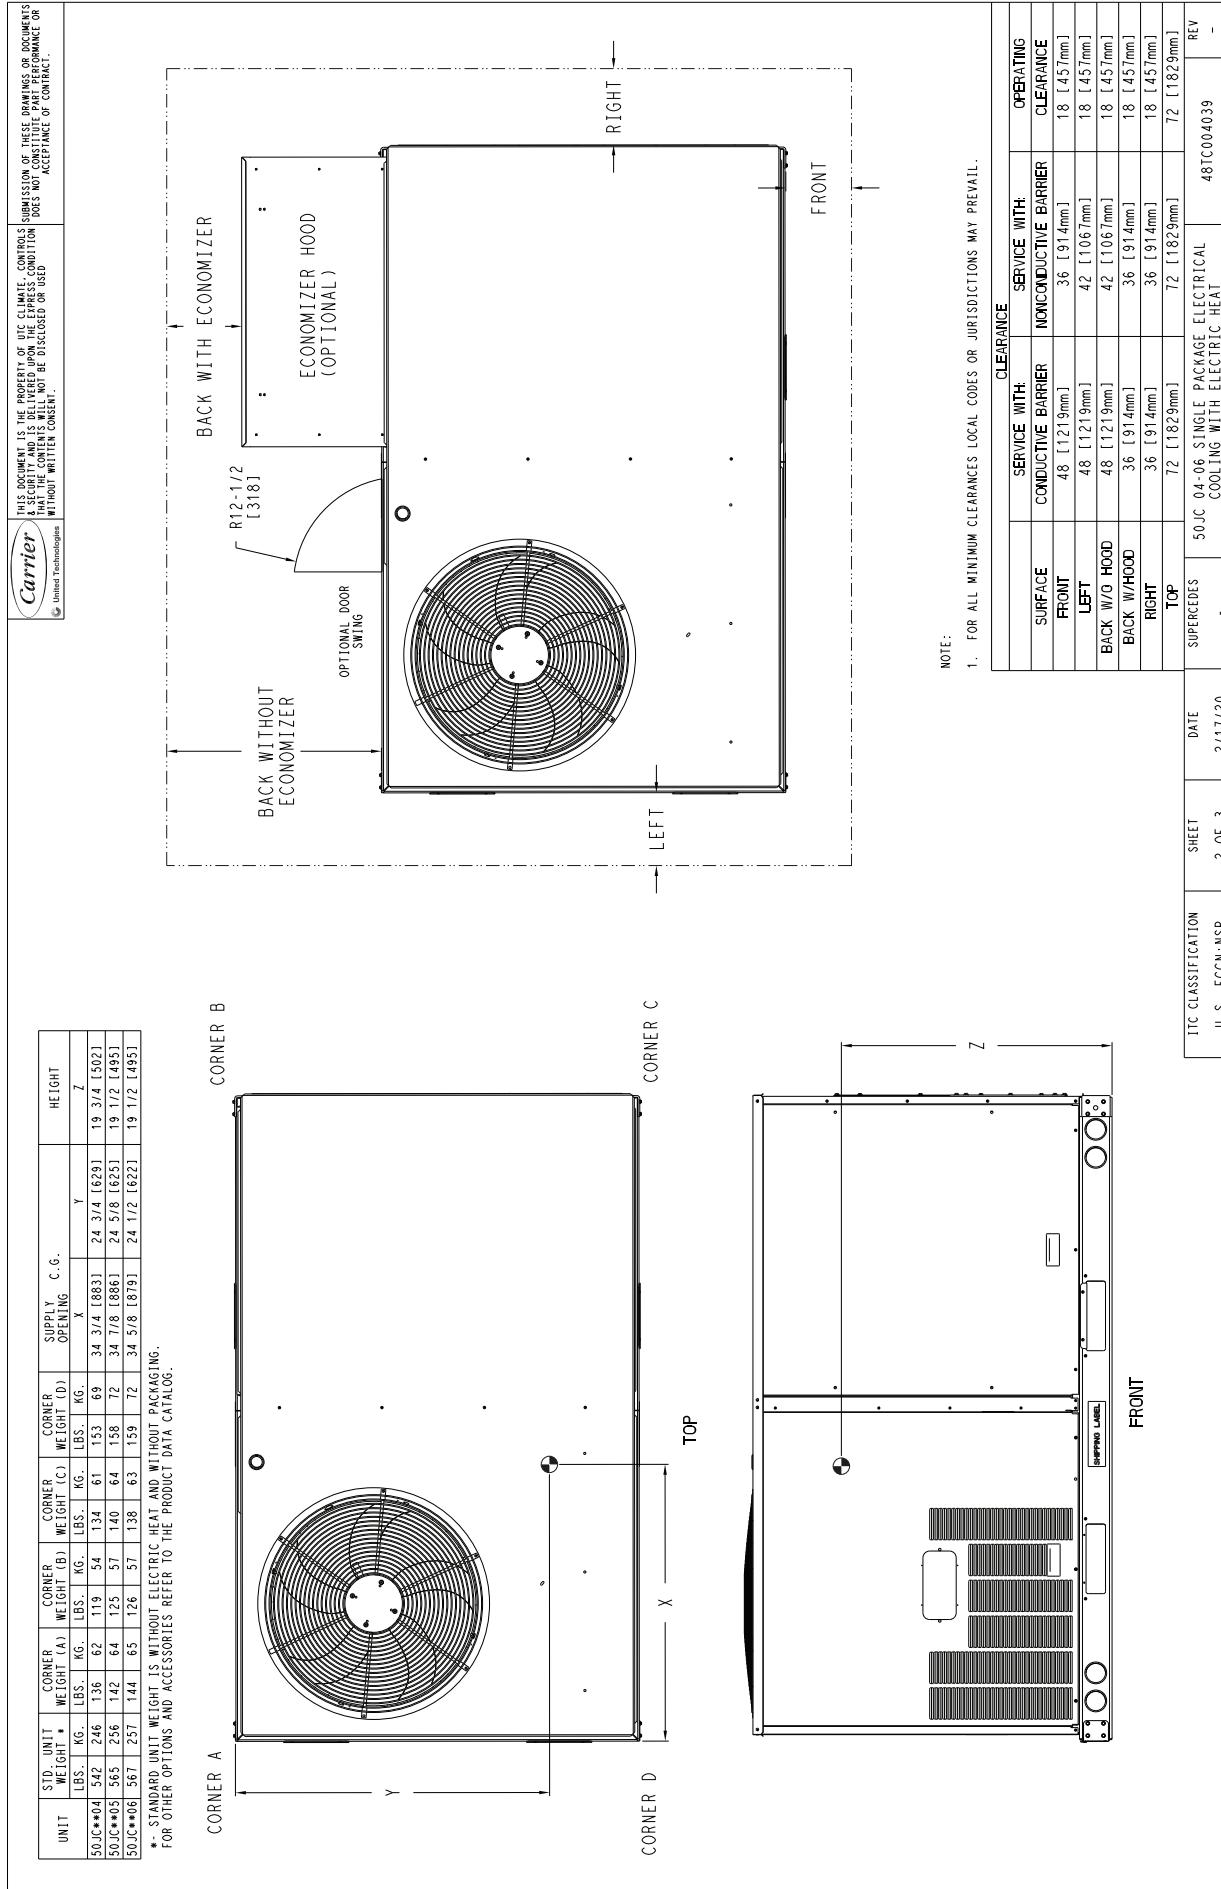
50JC04-06 Base Unit Dimensions (cont)
